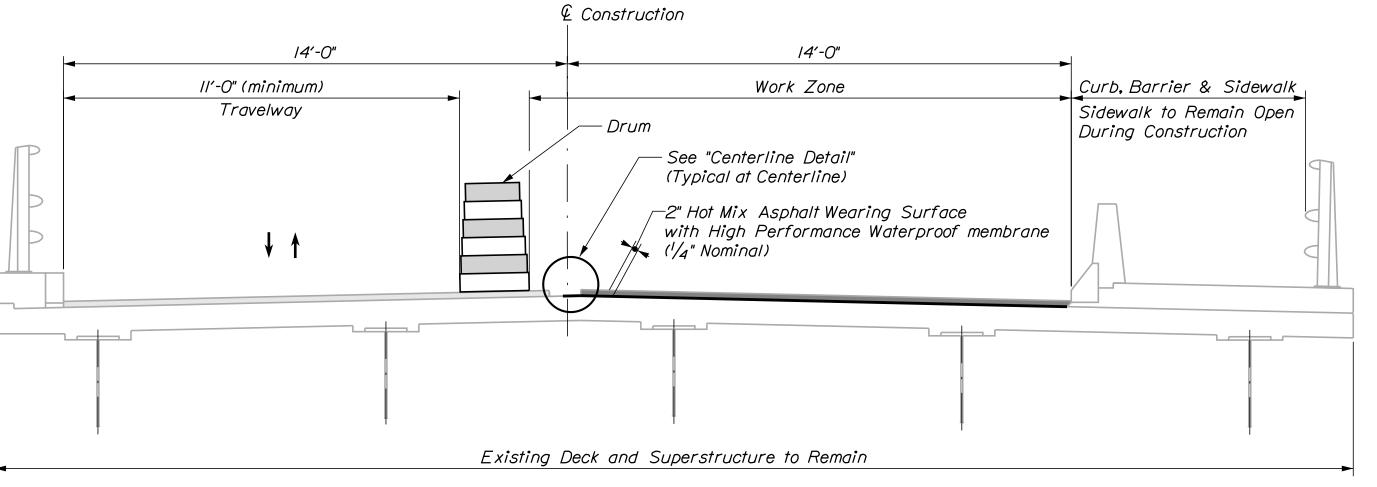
DETAILS Westport-Wiscasset Bridge COWSEAGAN NARROWS F, WESTPORT ISLAND LINCOLN SECTIONS A WISCASSET, TYPIC, SHEET NUMBER
